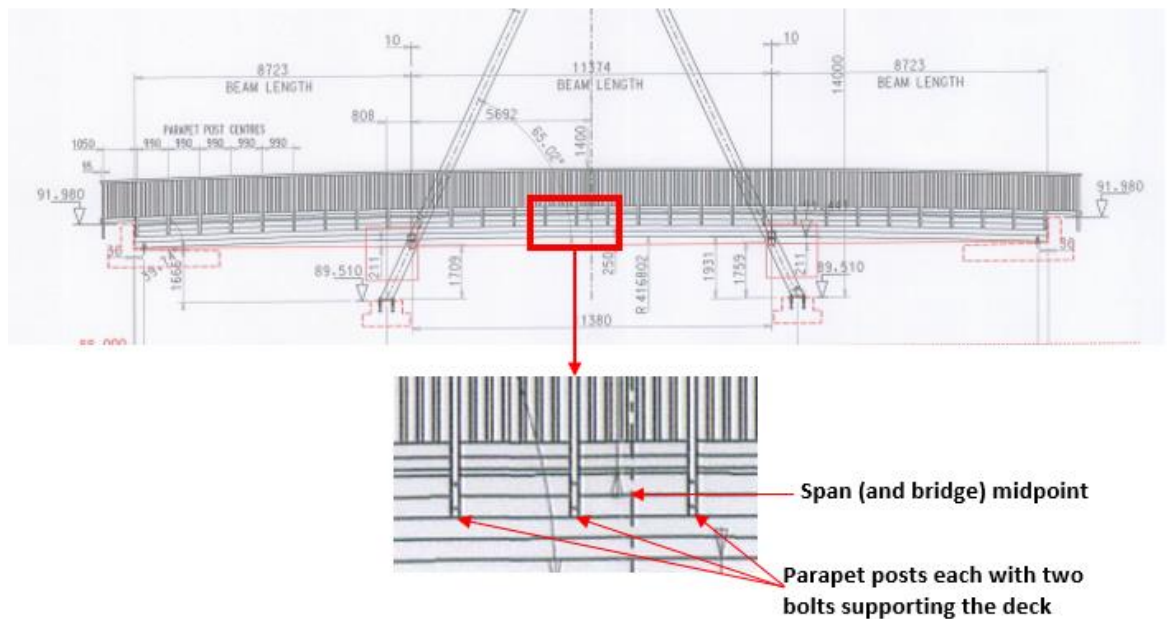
Bridge elevation drawing showing FOV and bolts
